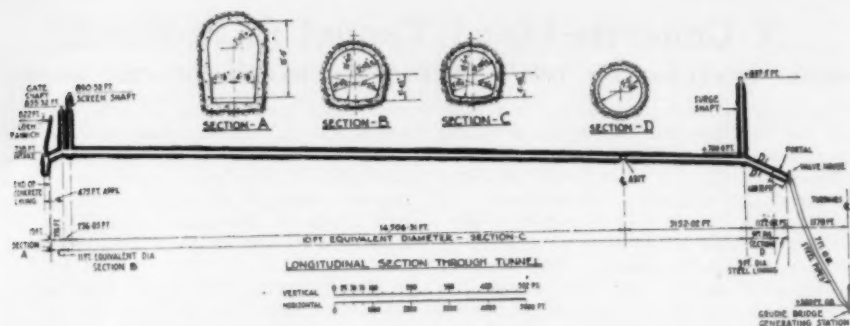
Longitudinal and Transverse Sections of Tunnel.
